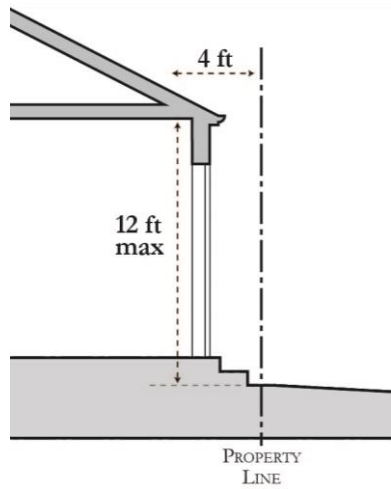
SECOND STORY SETBACK EXCEPTION
